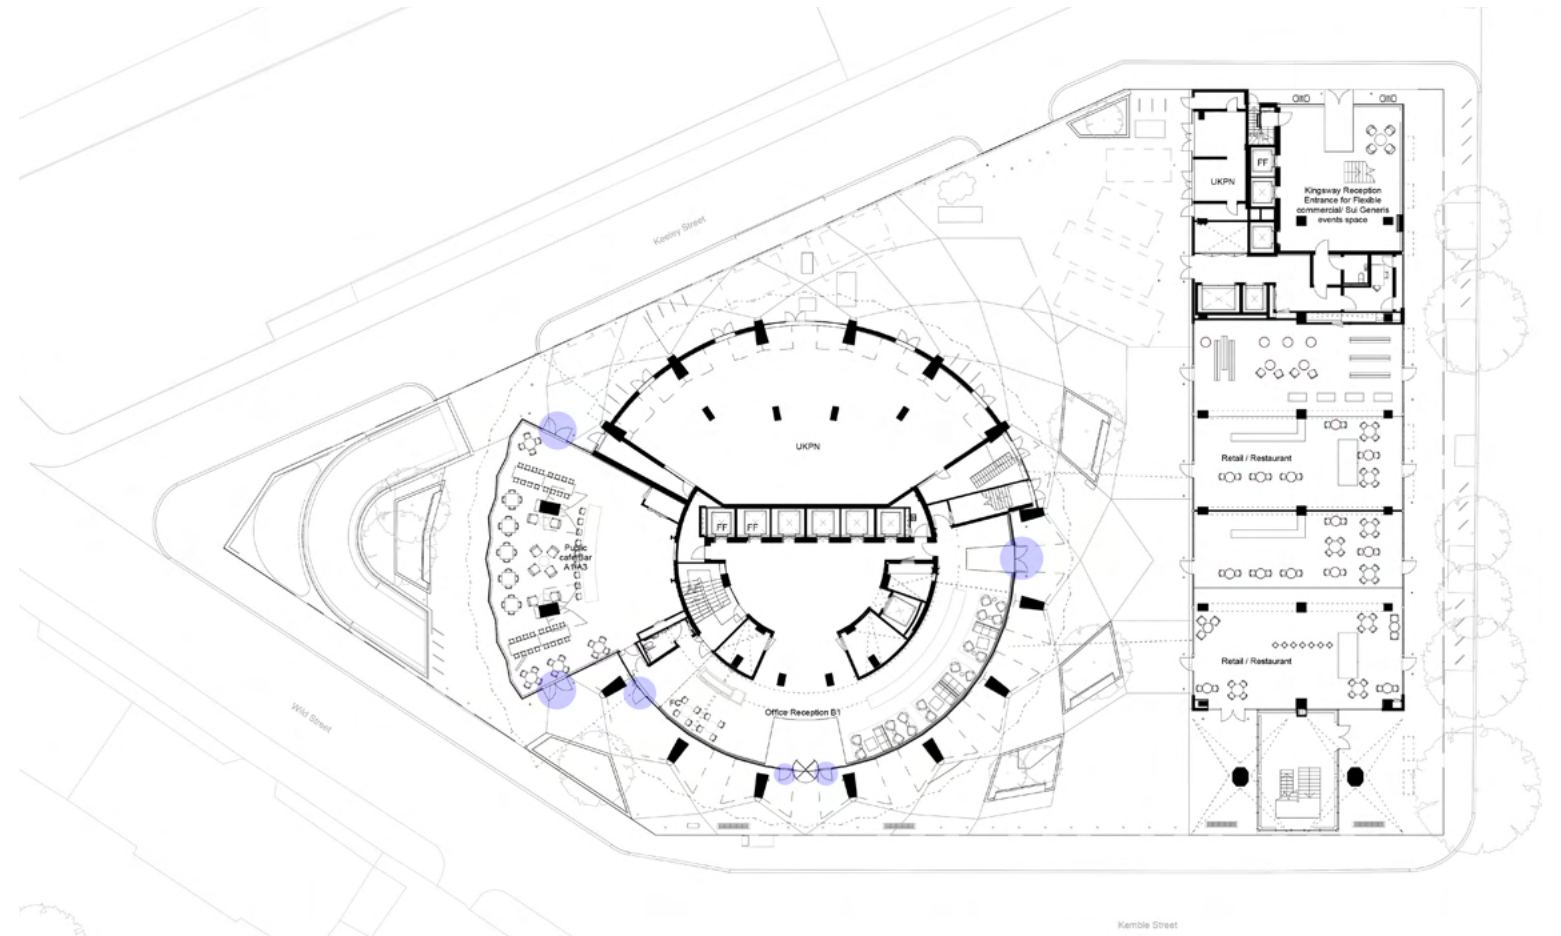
Ground Floor Plan - MAT 02 location
